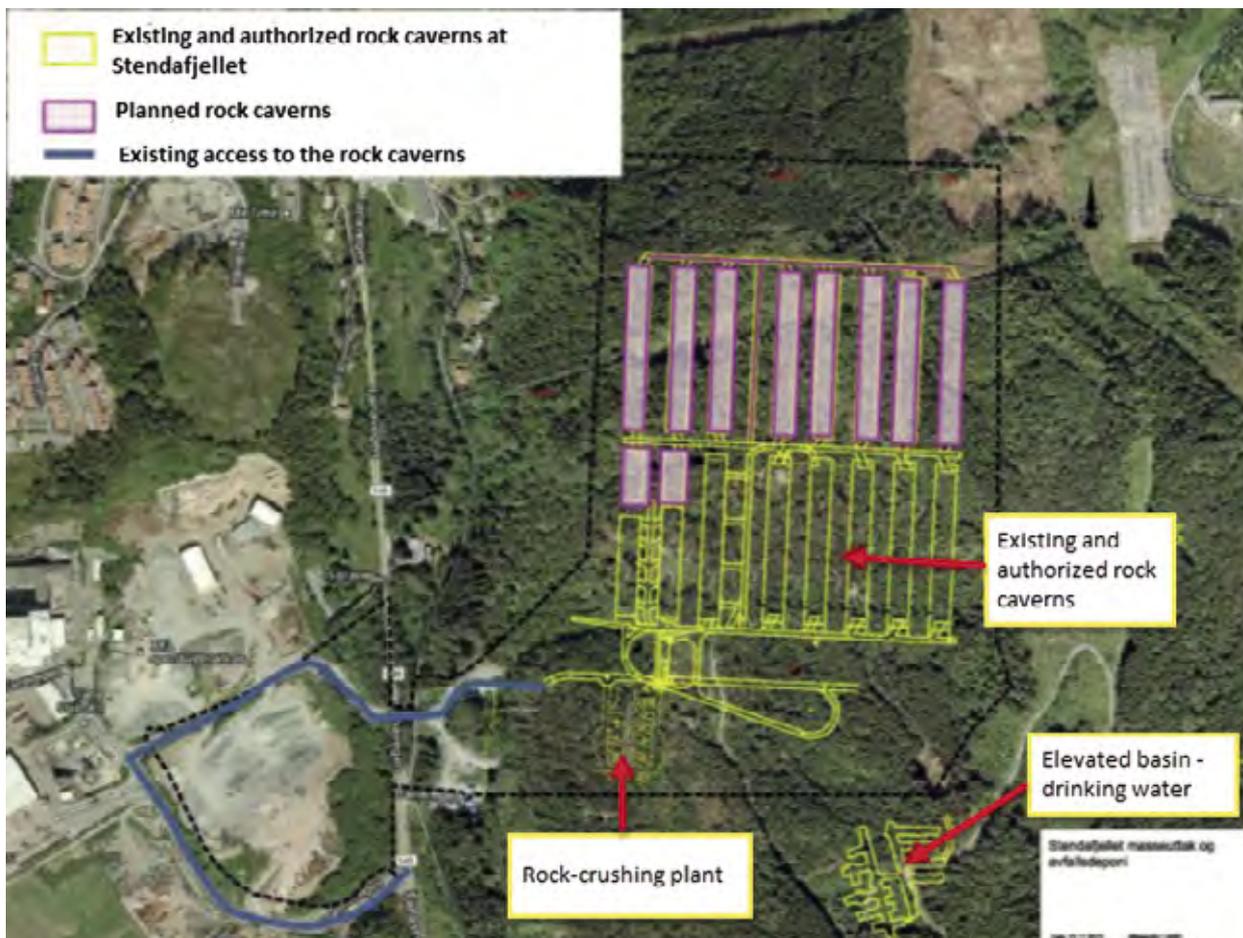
An illustration of the existing and planned rock caverns and plant at Stendafjellet.
